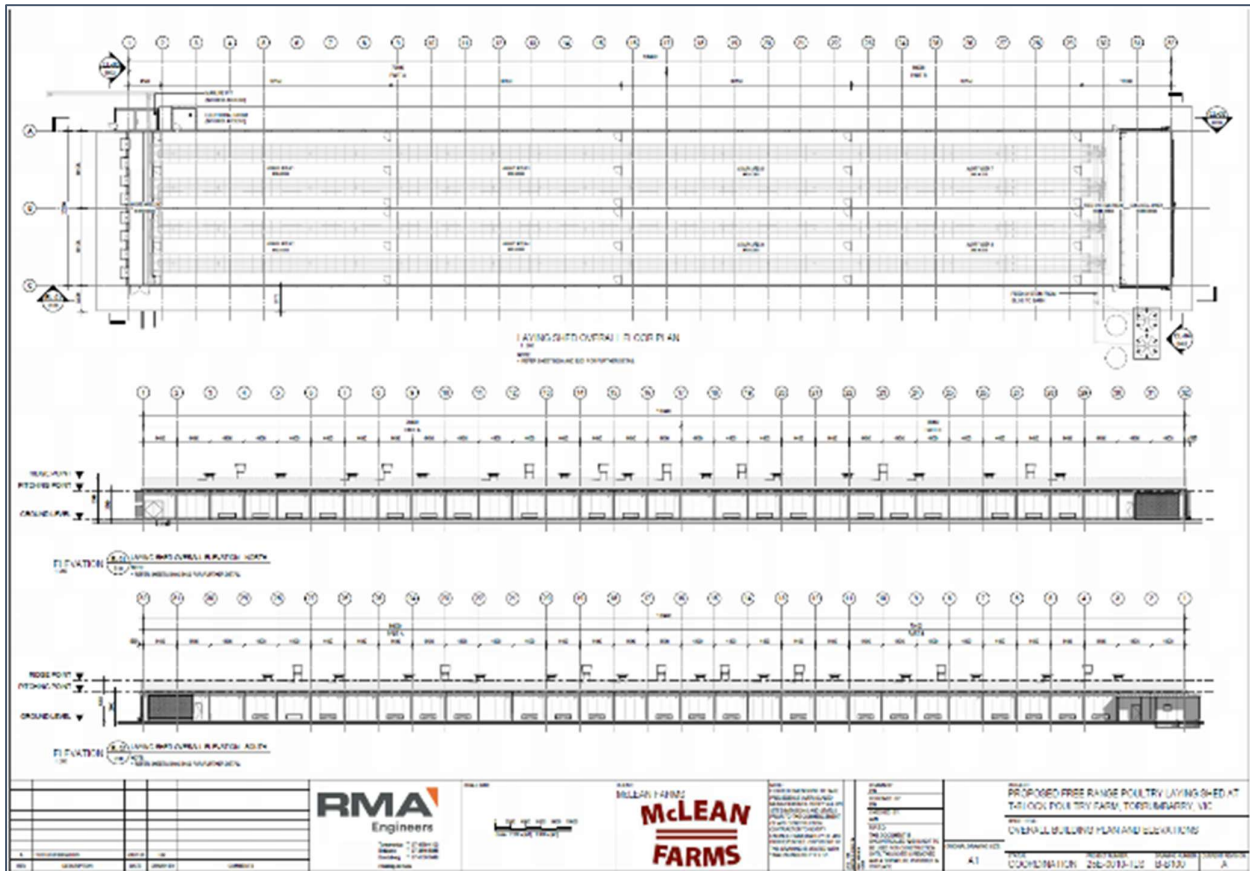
Proposed Layer Sheds - Site Plan (RMA Engineers, 2025)
